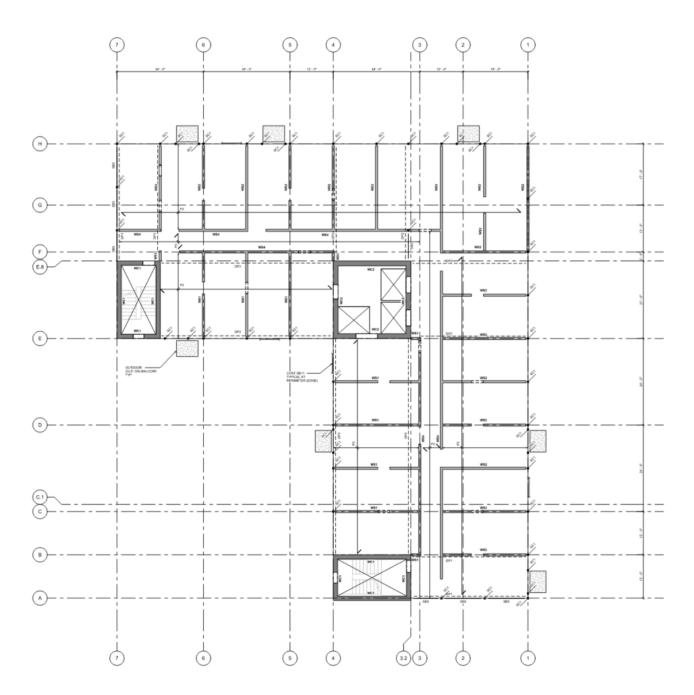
Typical floor plan for 11-storey MAC building, Vancouver, Canada
